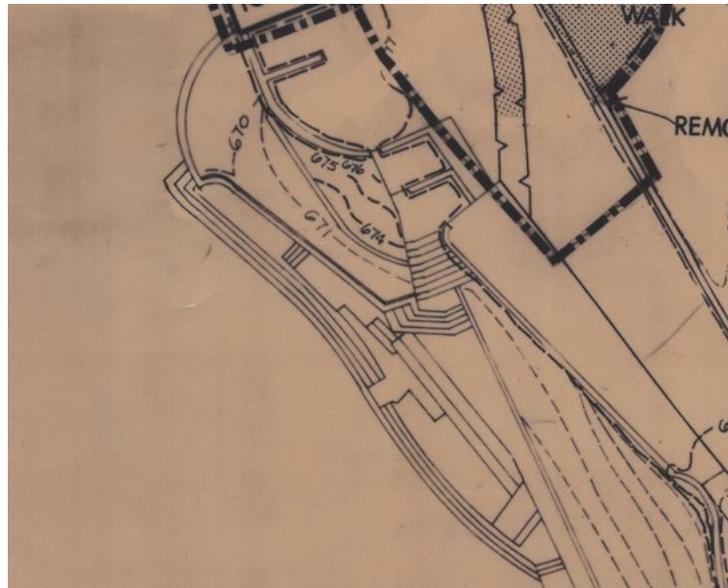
Section C, a river-level staircase, as drawn in 1981. The staircase extends to the Pump House #1 outlet (Reyna/Caragonne Associated Architects 1981).
